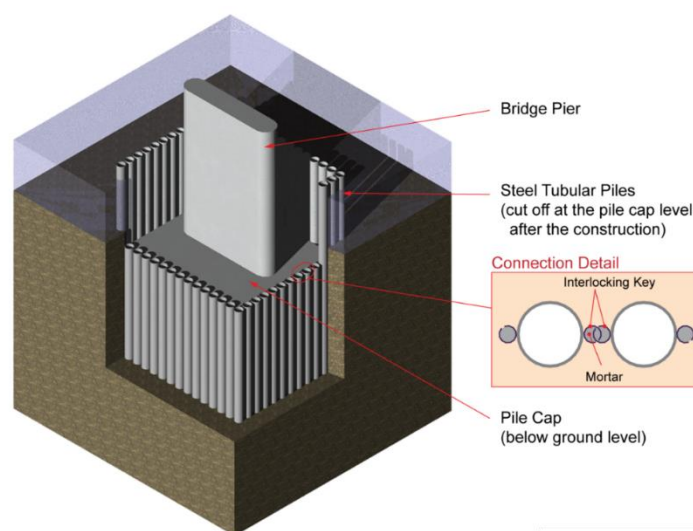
Overview of Steel Tubular Pile Cofferdam Foundation
